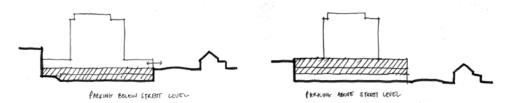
The proposal activates the street by providing a retail tenancy at street level and reduce the overall height, and mass of the Patrick Street frontage by providing parking below ground level. (Source: HBV Design Statement)
